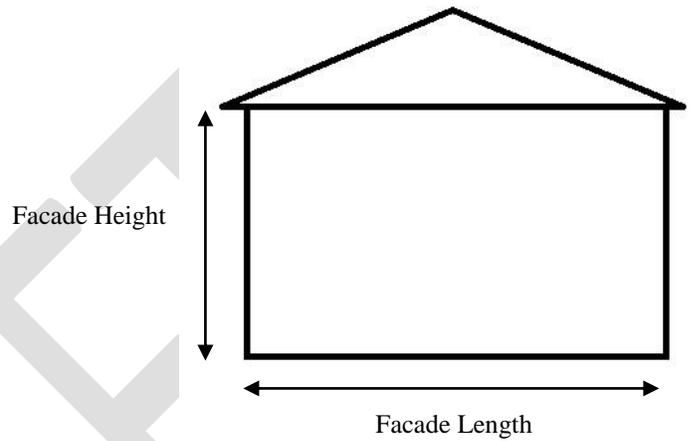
Multi-Tenant Façade Calculation Example #1
